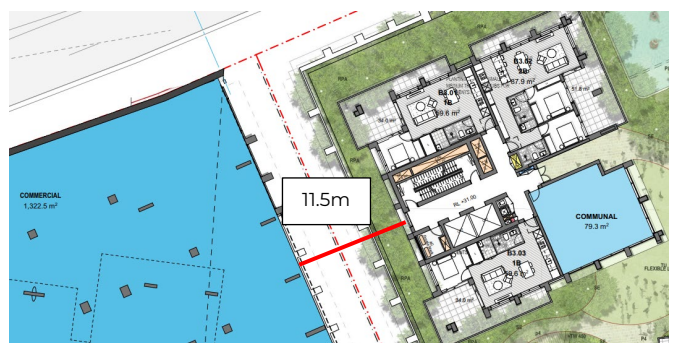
Building Separation Between Building 1 and Building 2.1 on Level 3
